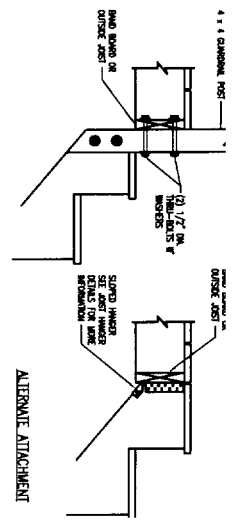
STAIR STRINGER CONNECTION DETAIL
